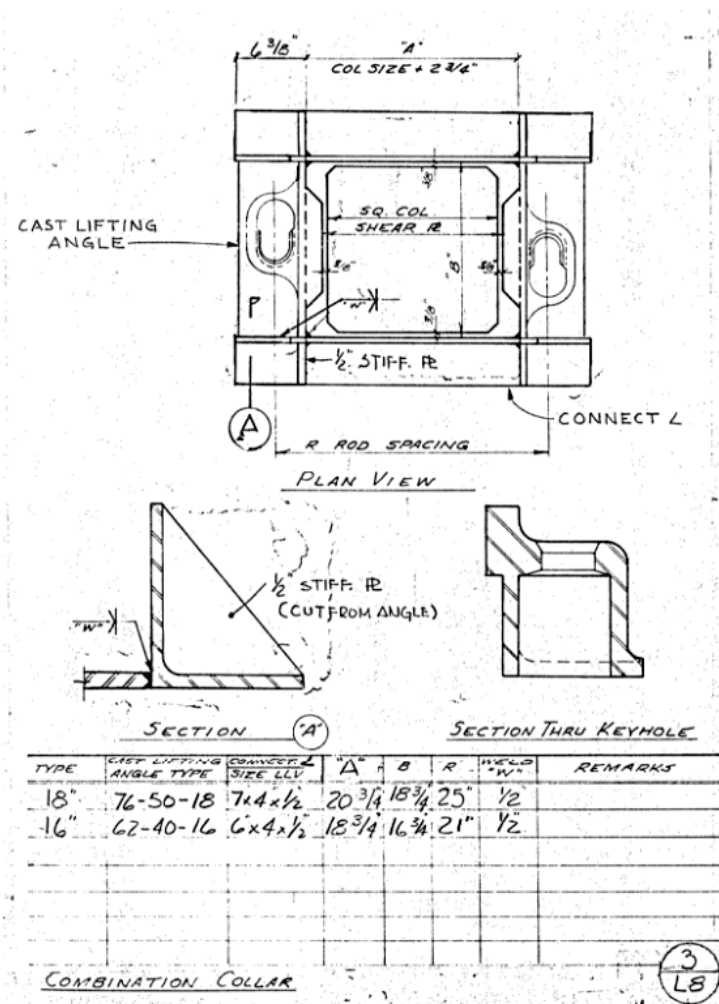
Plan View of Lifting Collar, Detail 3/L8
